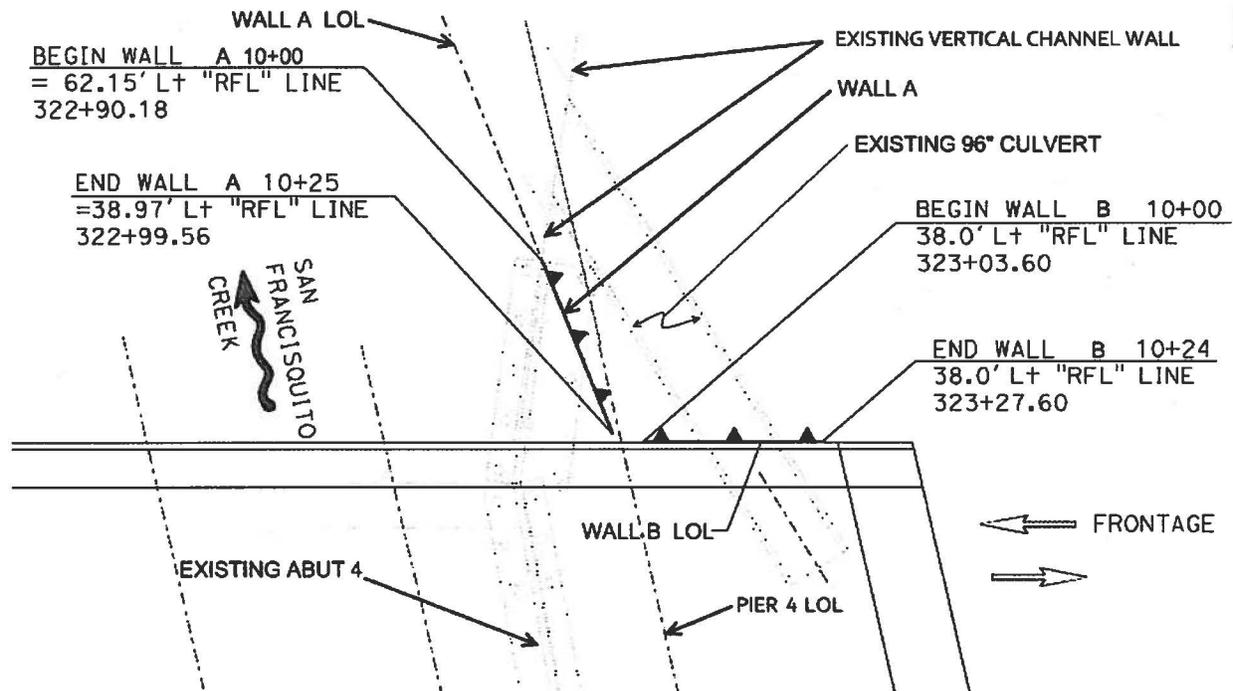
Wall A, Pier 4 and Existing Wall Layout, Plan View
